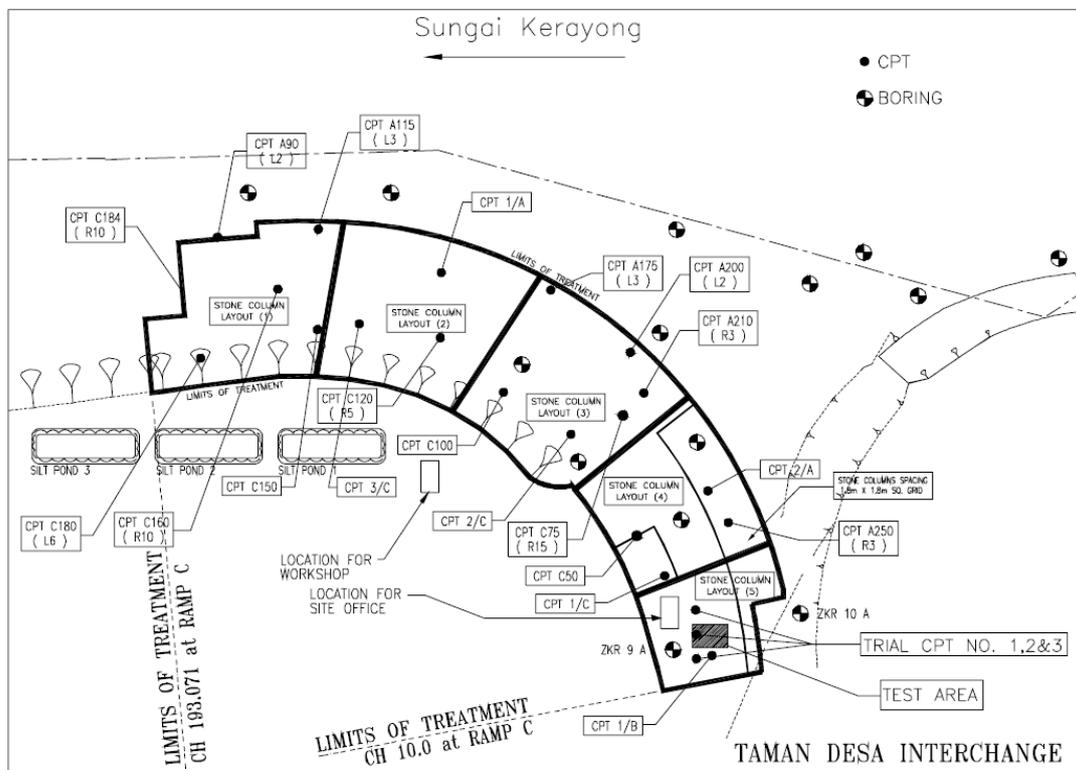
Plan of the construction site at Taman Desa Interchange
